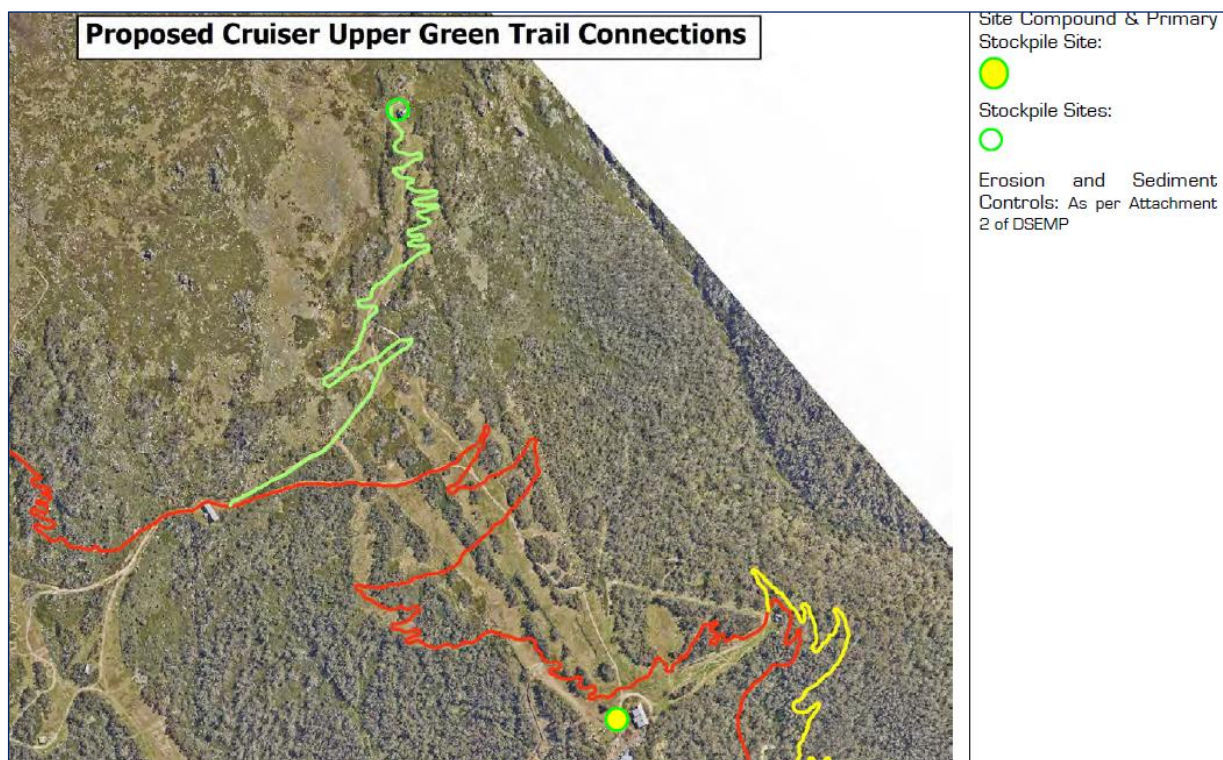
| Proposed site compound / stockpile locations (Source: Applicant's documentation)
